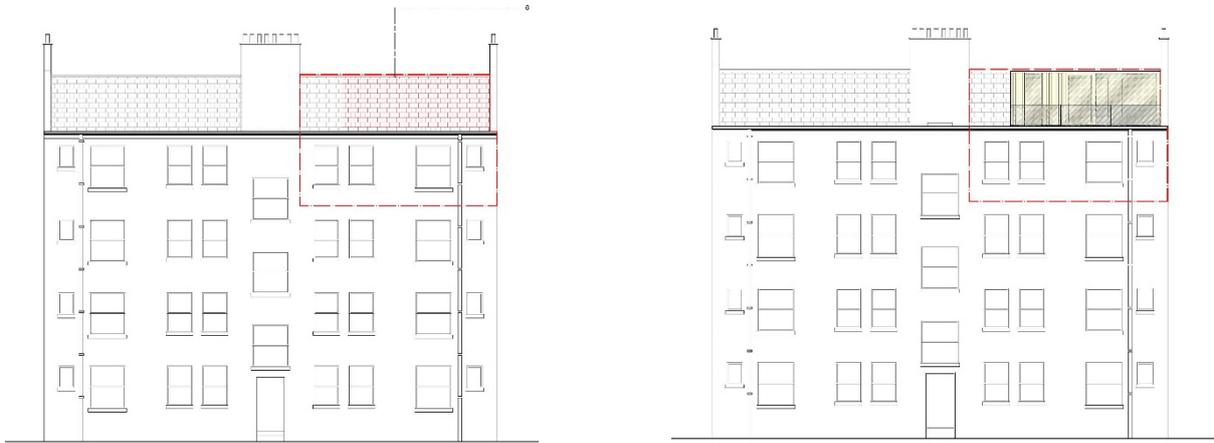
Images of approved existing (left) and proposed (right) elevations for a flat roofed attic extension onto an existing flat roof above a top floor flat in a tenement building
